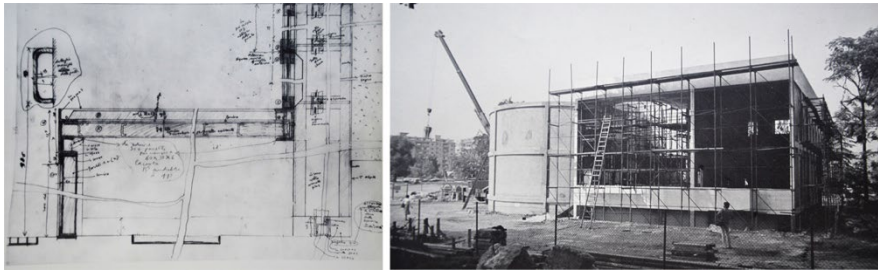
Window detail and Pavillon in 1977 during construction (courtesy of G. Gresleri's Archive).
